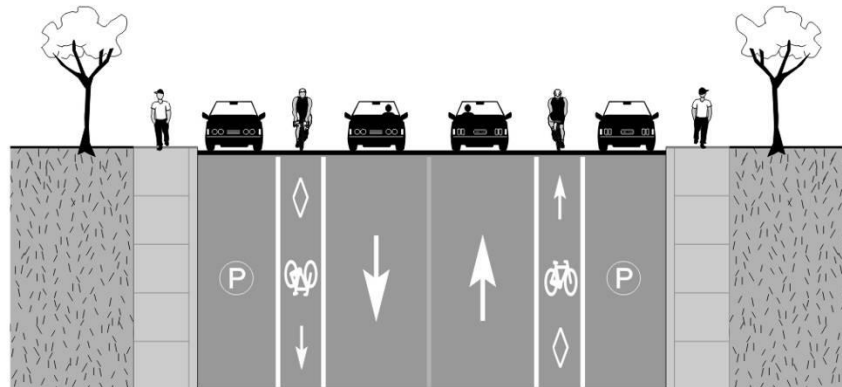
Typical Bike Lanes Adjacent to On-street Parking (Source: Halton Hills Cycling Master Plan Final Report)
